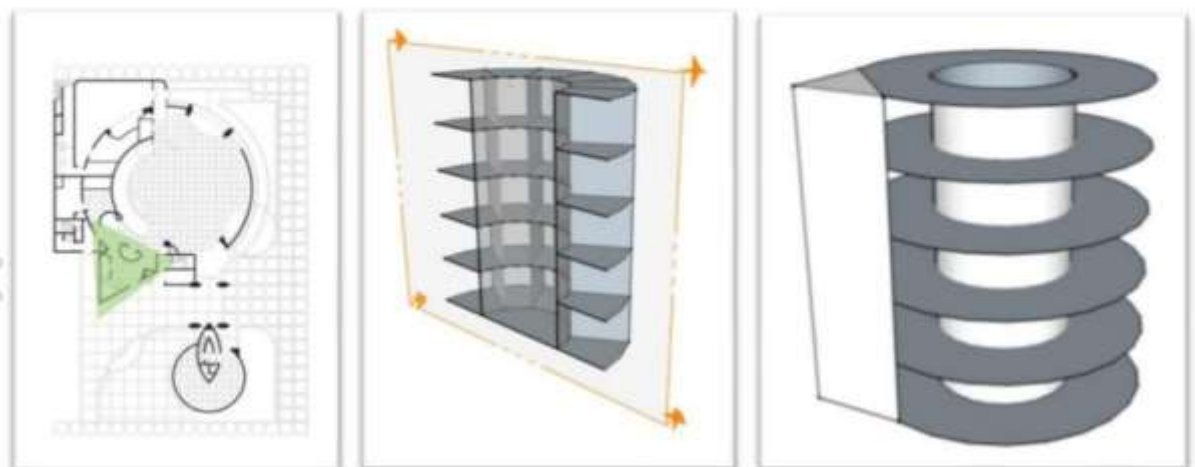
(i) Structural Details of Guggenheim Museum
